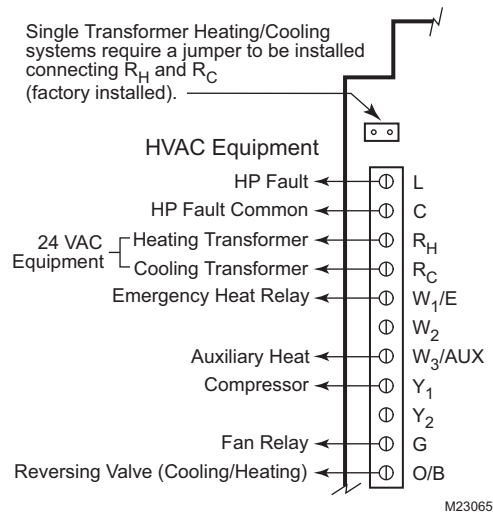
Wiring single-stage heat pump with separate Auxiliary and Emergency Heat.
